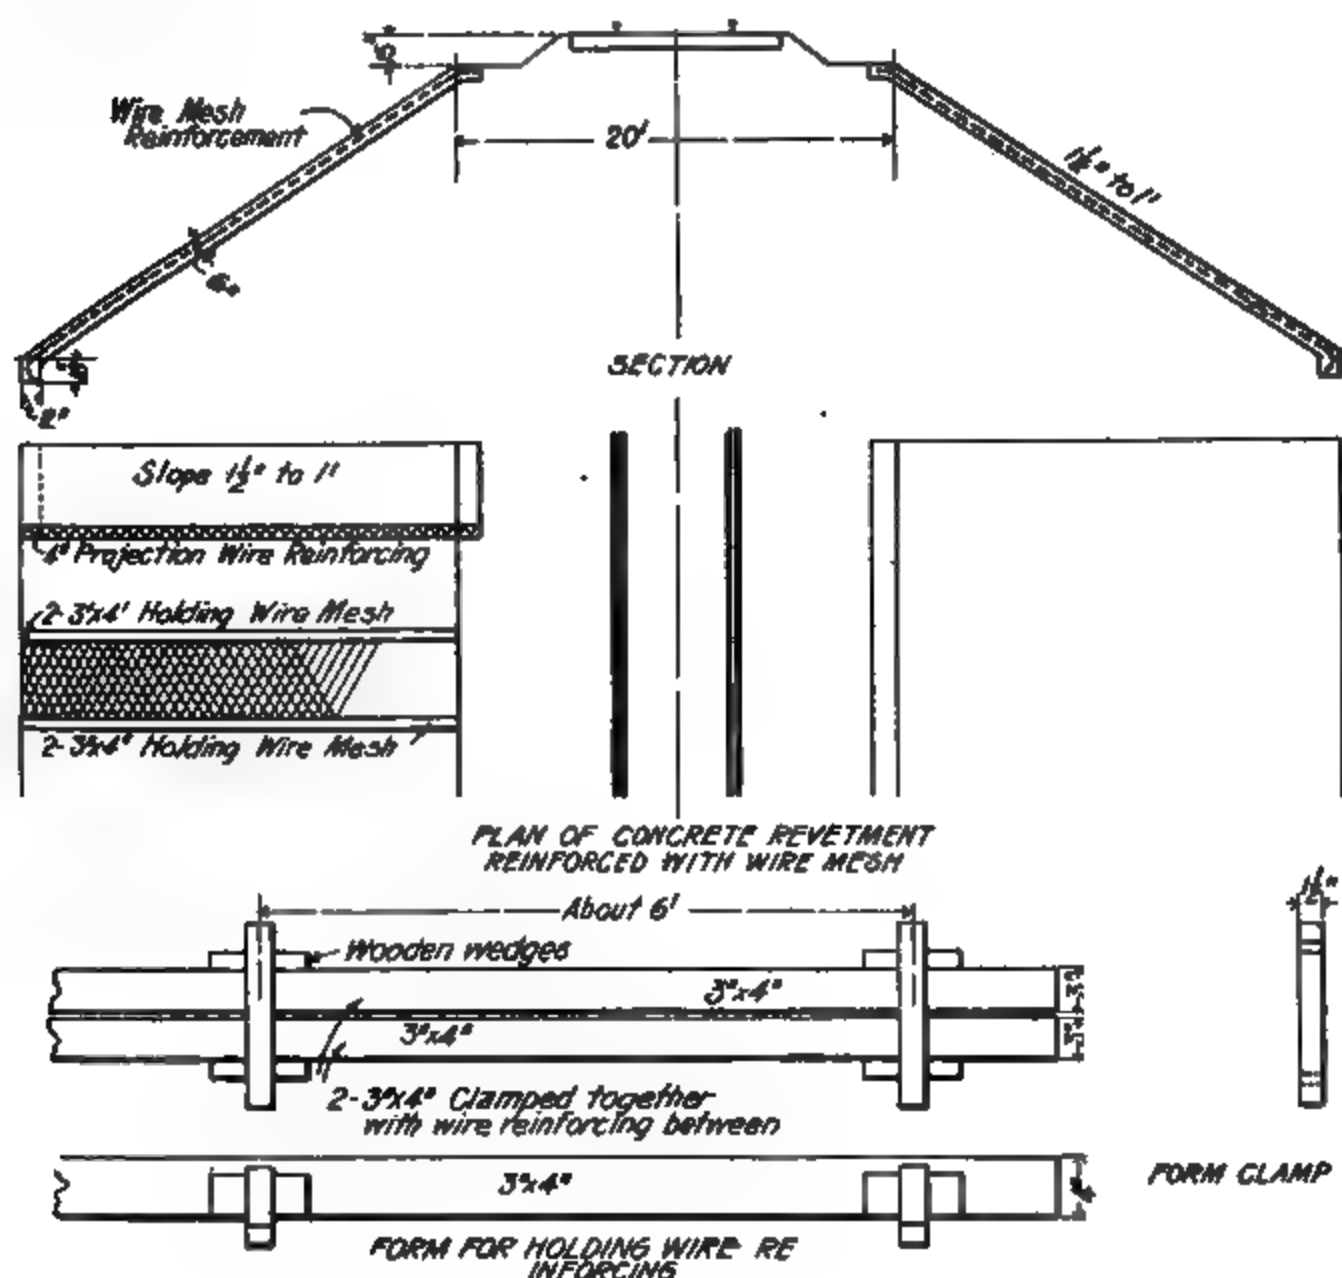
Reinforced Concrete Slab Bank Protection, Southern Pacific Co.
